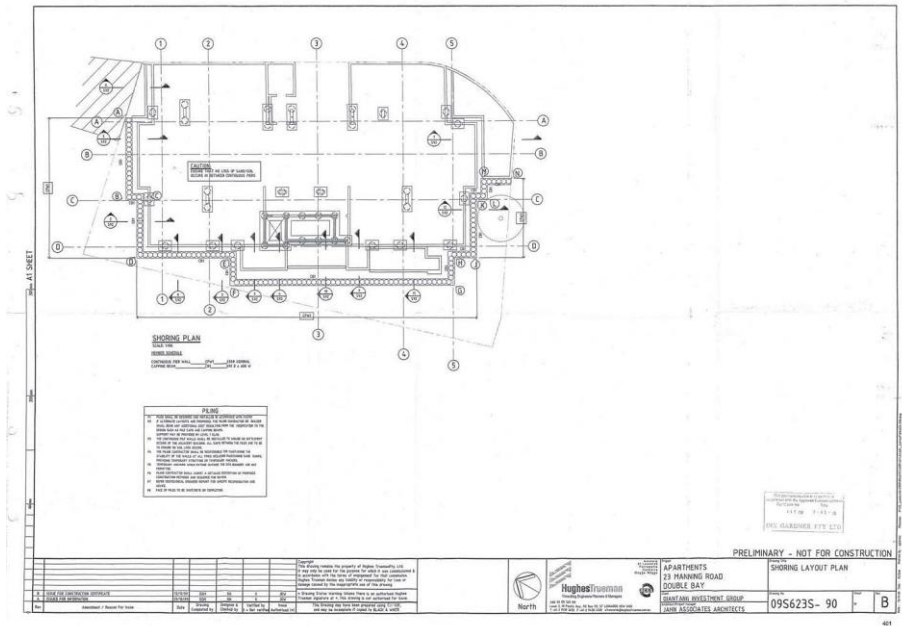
Figure C: Northwood's Design – Level 0 – Shoring Wall with Straight Western Section, Shoring Props and Lateral Loading Piles with Capping Beams
